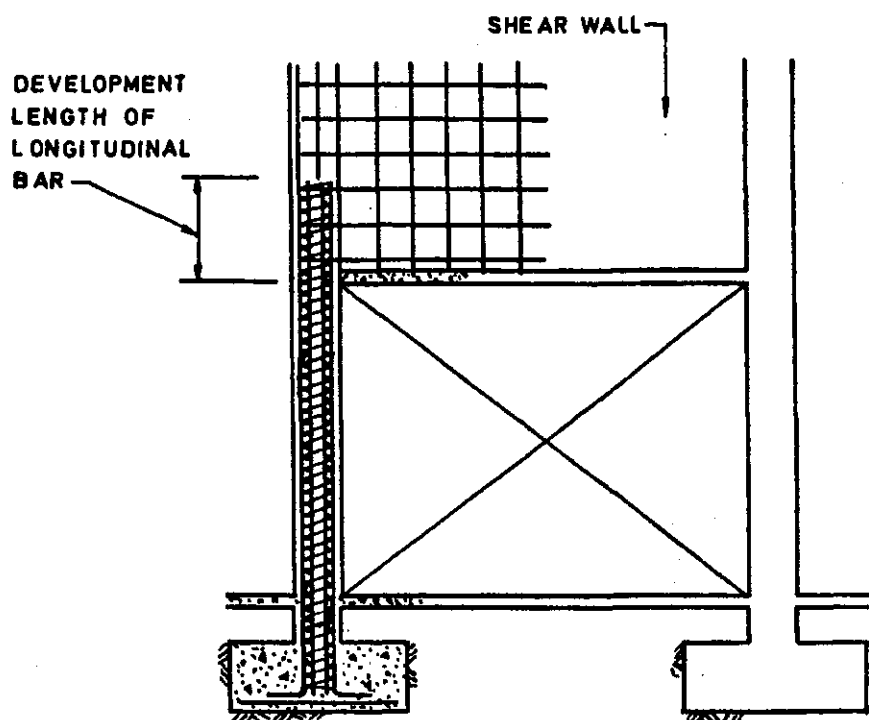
SPECIAL CONFINING REINFORCEMENT REQUIREMENT FOR COLUMNS UNDER DISCONTINUED WALLS
